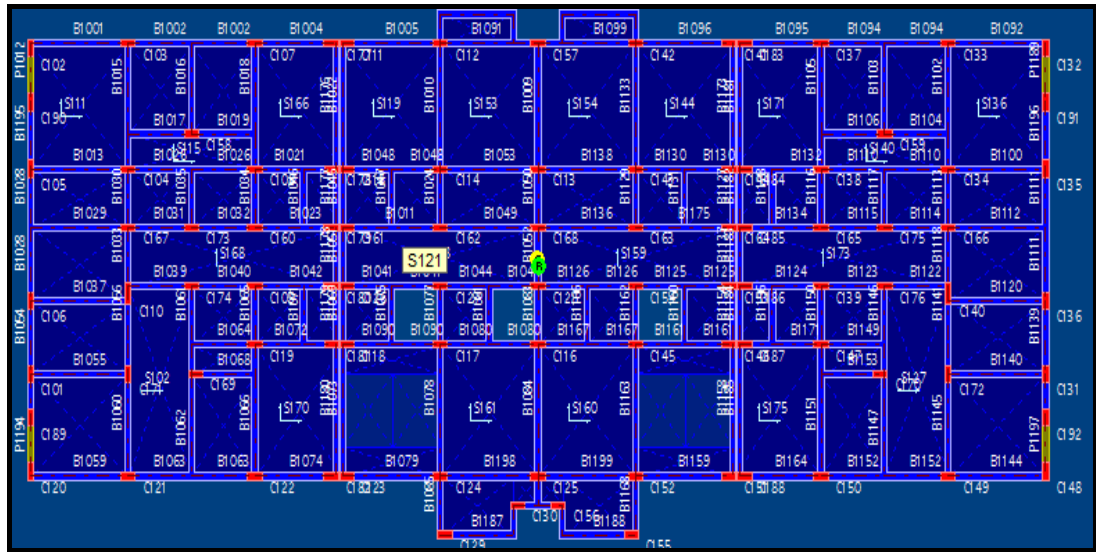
Plan of Buildings with Five Stories and Shear Wall System
